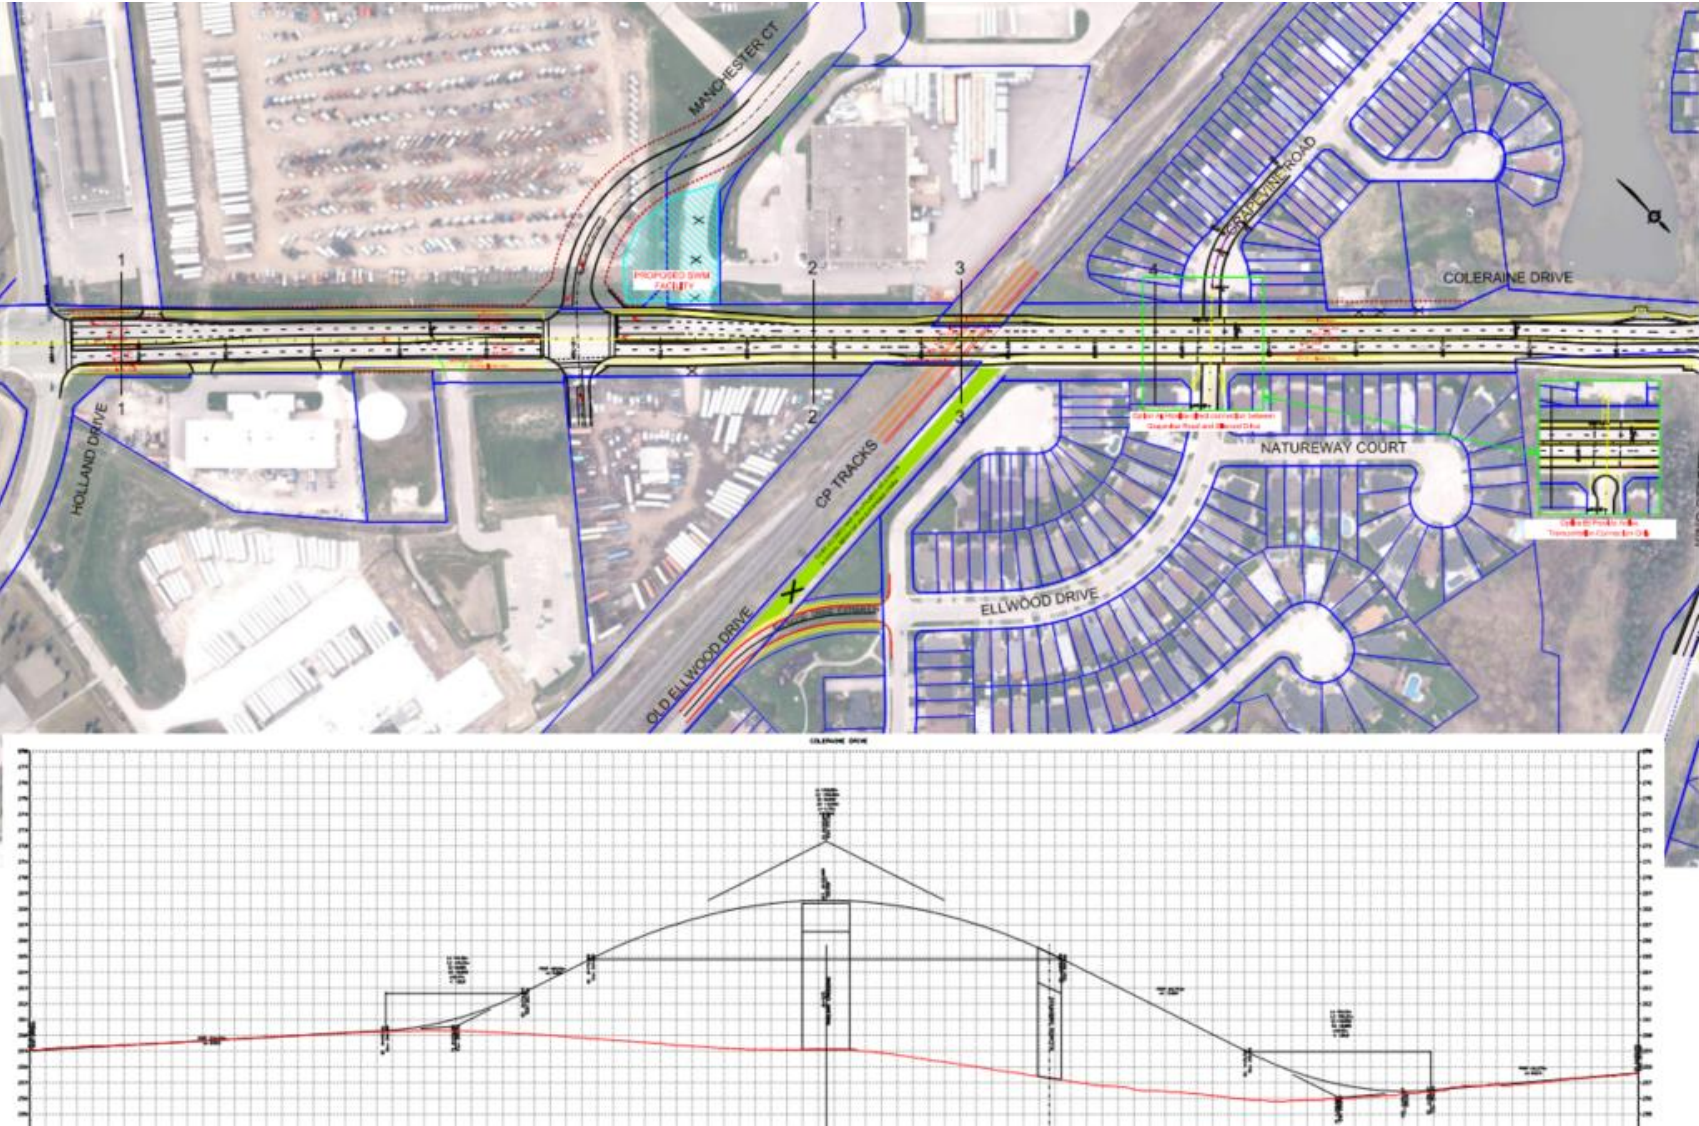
Coleraine Drive Alternative 2 - Road Over Rail
